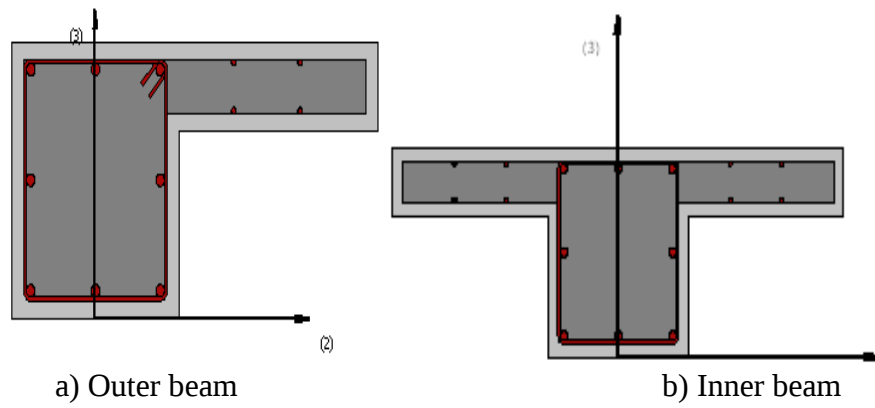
T- beam section 0.4x0.35 (8 No.18) for 4 story building: a) Outer beam and b) Inner beam.
